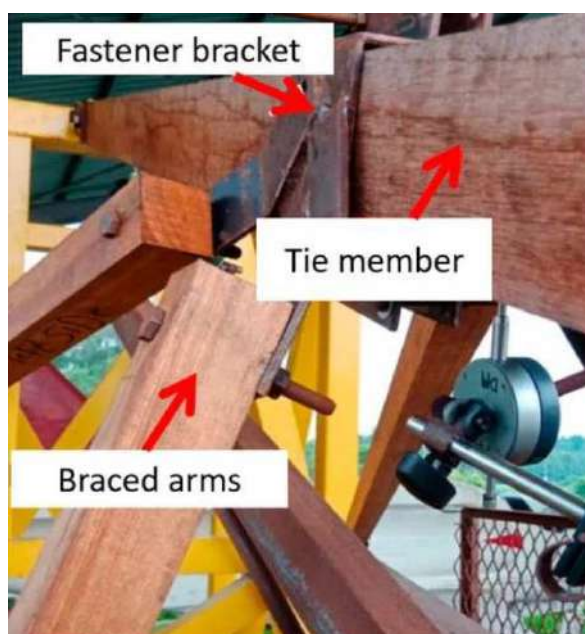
Joint of the tie member with the bracing members using a mild steel fastener bracket [27].
